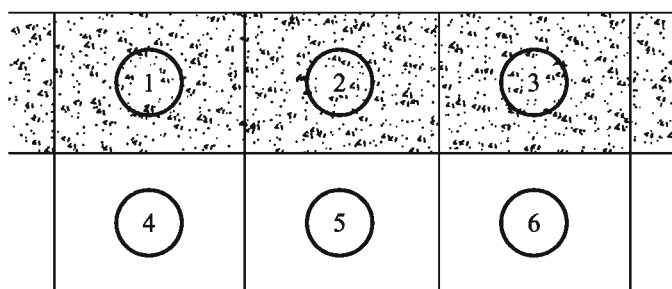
CONTINUOUS CONSTRUCTION METHOD
